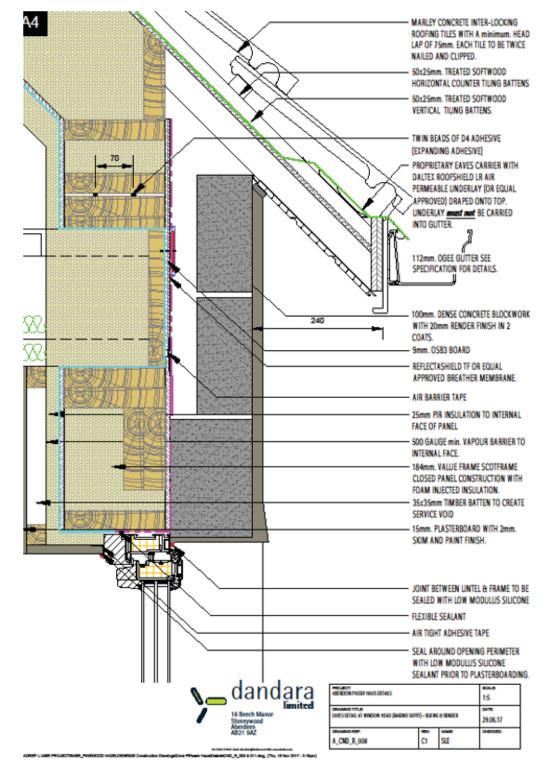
Construction details through window head, mid-floor and eaves. Dandara Homes Limited
